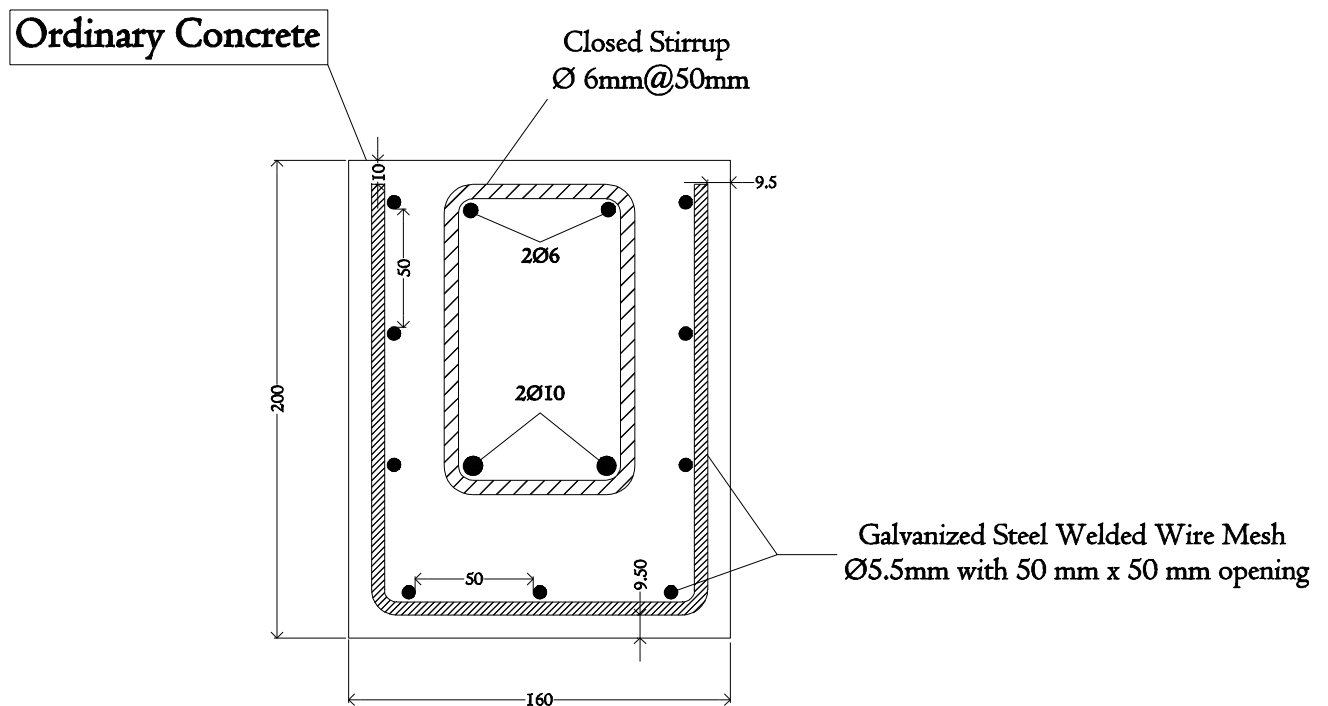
Monolithic beams MB.B1 and MB.B2 cross section (mm).
